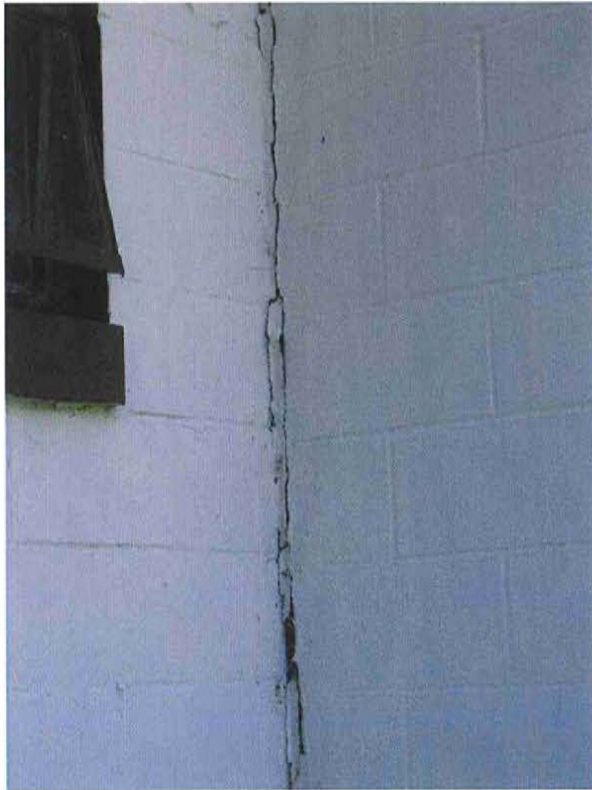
Control Building - View of east wall of grit room addition where it joins the original north wall of the control building, showing deterioration of the "hard" (mortar) joint.
